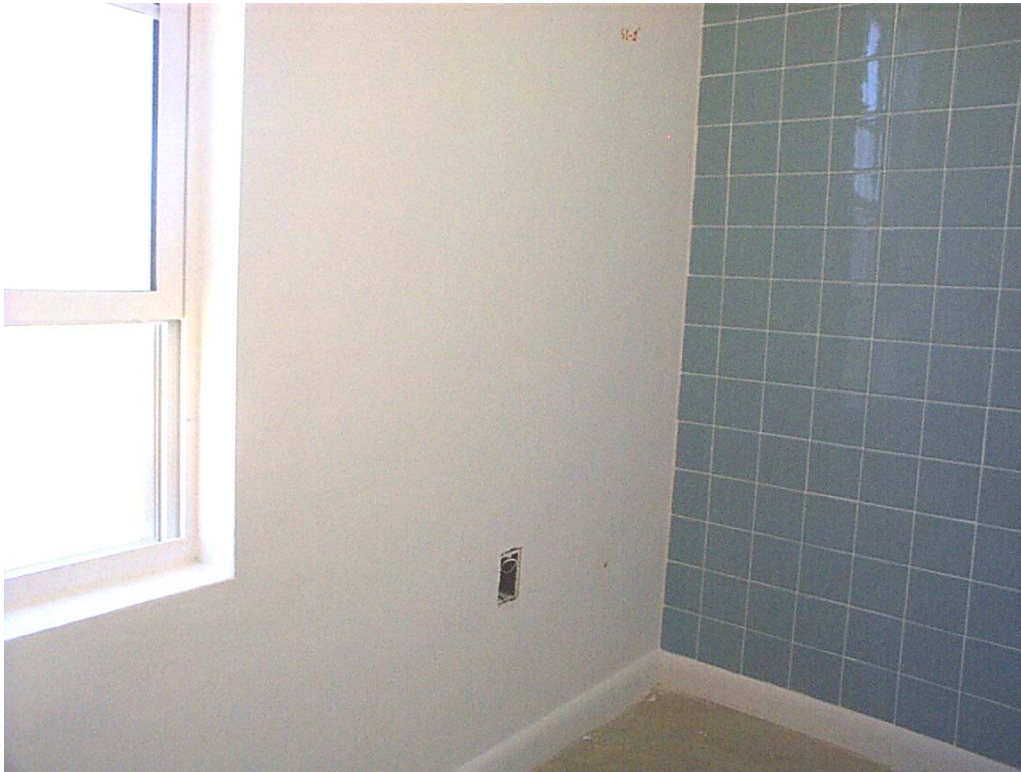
Module S-1 (Walls 1 & 2) Pre-flood. Walls, window, floor are in new condition.
